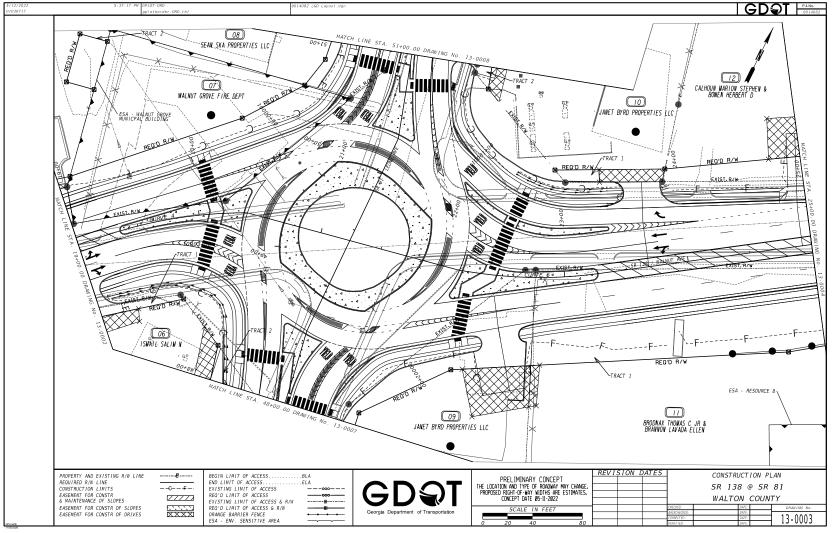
Proposed roundabout at theintersection of SR 138 &SR 81
